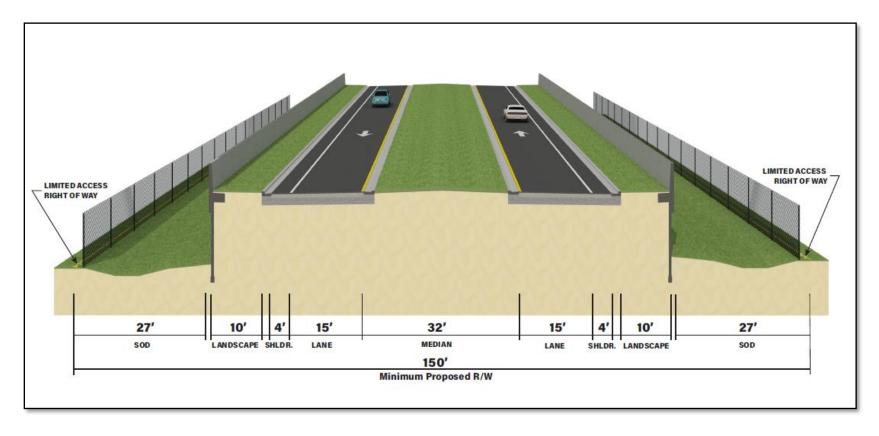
SR 417 (Seminole Expressway) Sanford Airport Connector Proposed Typical Section
